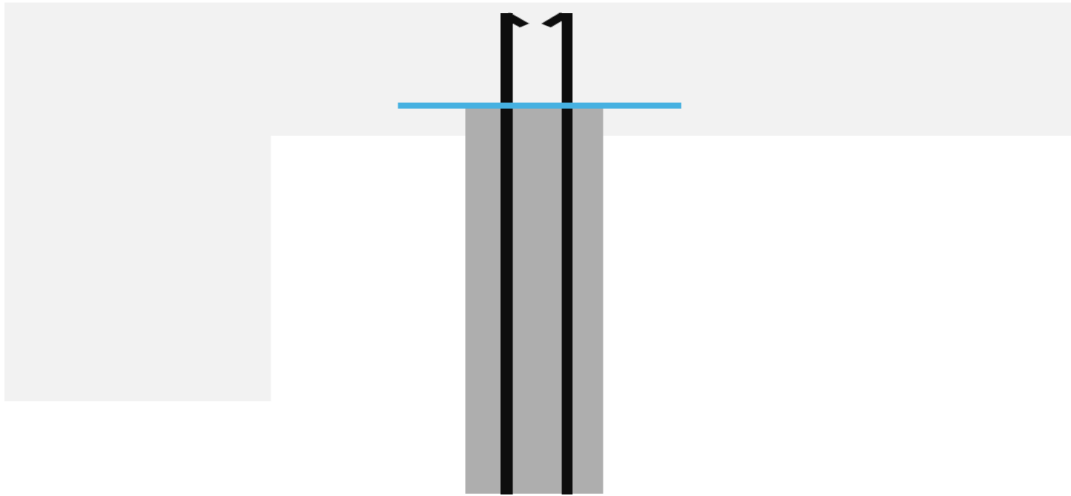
Sketch of a connection between the pile and the bridge deck.
